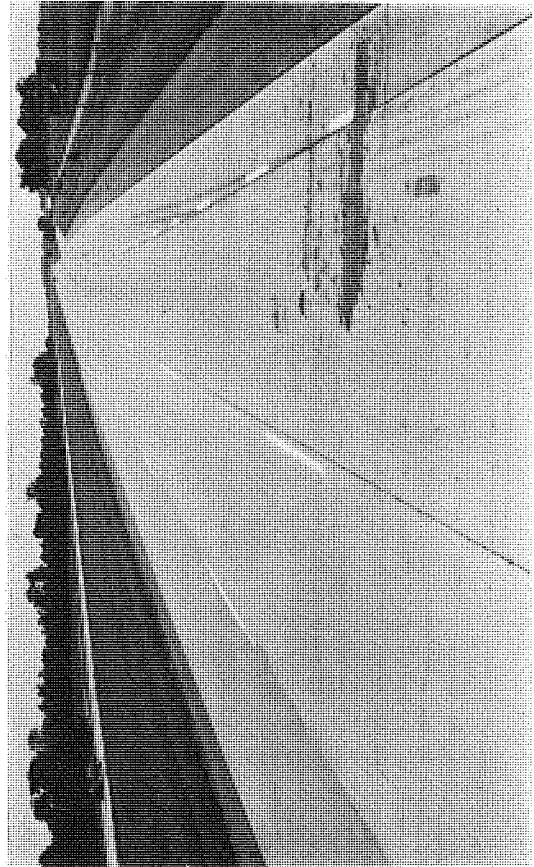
Wet condition of transverse cracks three days after a summer shower indicate the greater ability of a CRC pavement to move water to and from the base compared with conventional concrete pavements.
